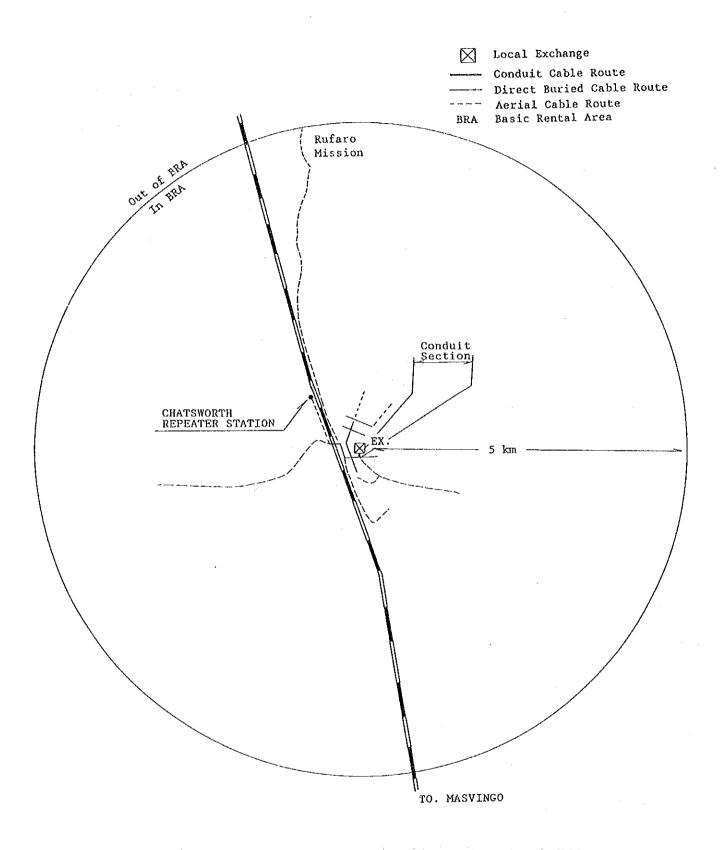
(5/6) Local Cable Distribution Plan in BRA (Chatsworth Exchange)
